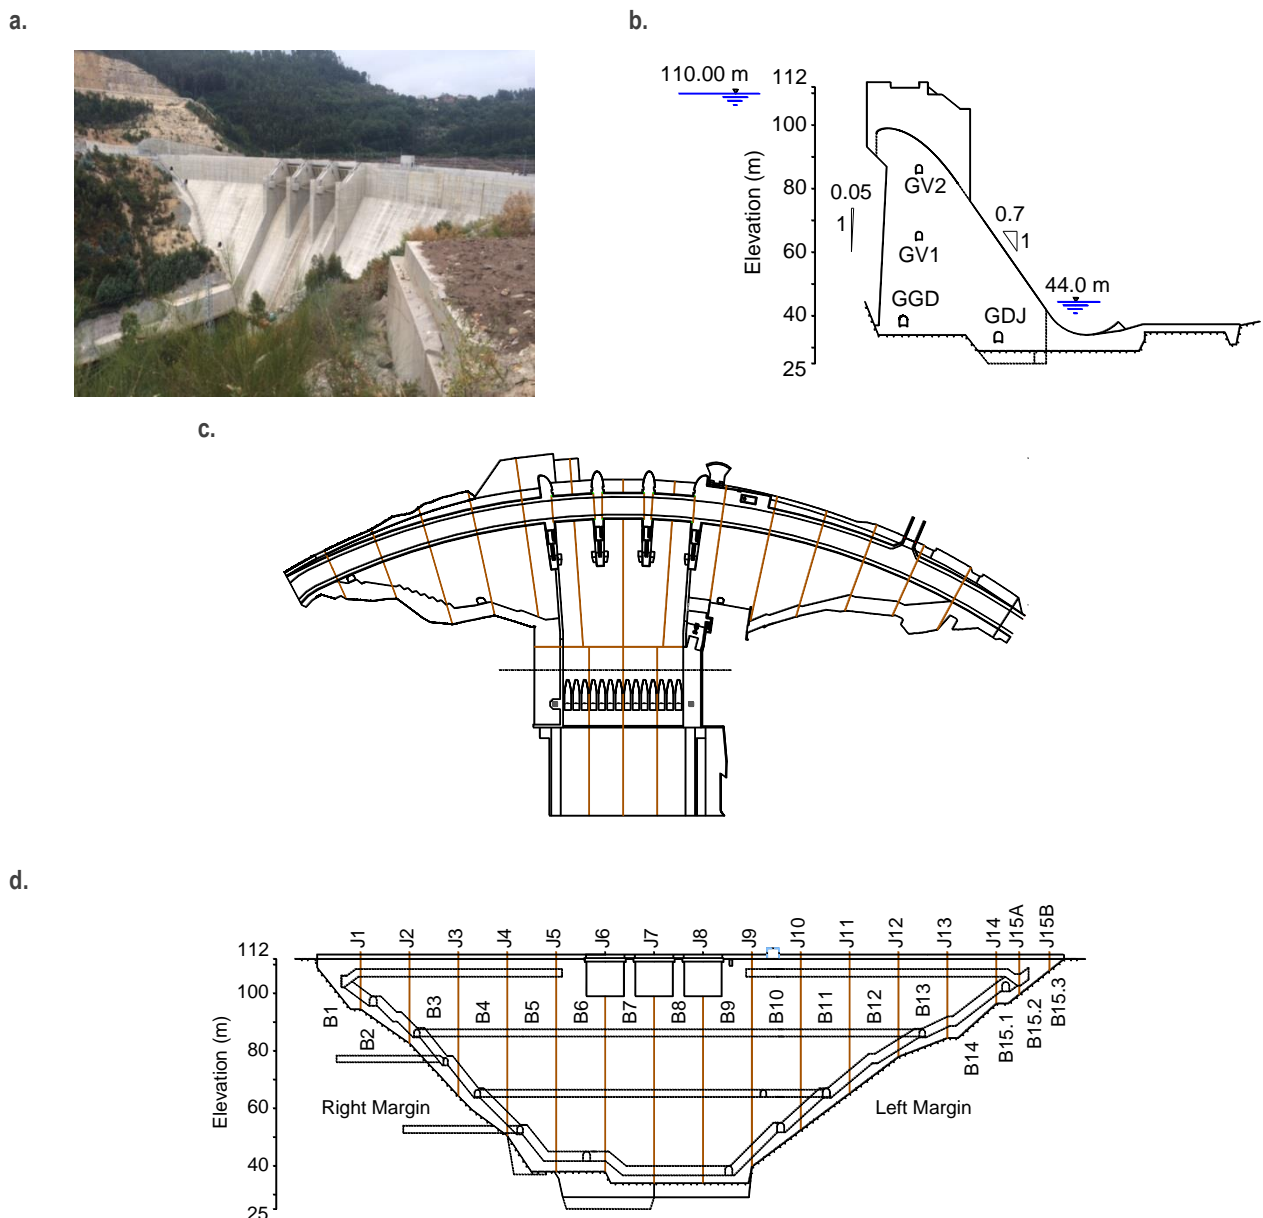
Gravity dam. (a.) Downstream view (photo). (b.) Cross section (block 7, B7). (c.) The site plan. (d.) Downstream view
